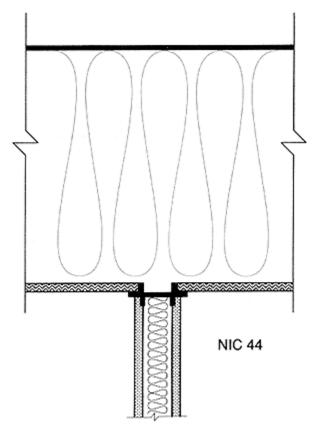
Plenum packed with glass fibre above the partition wall - the fuzzwall approach
